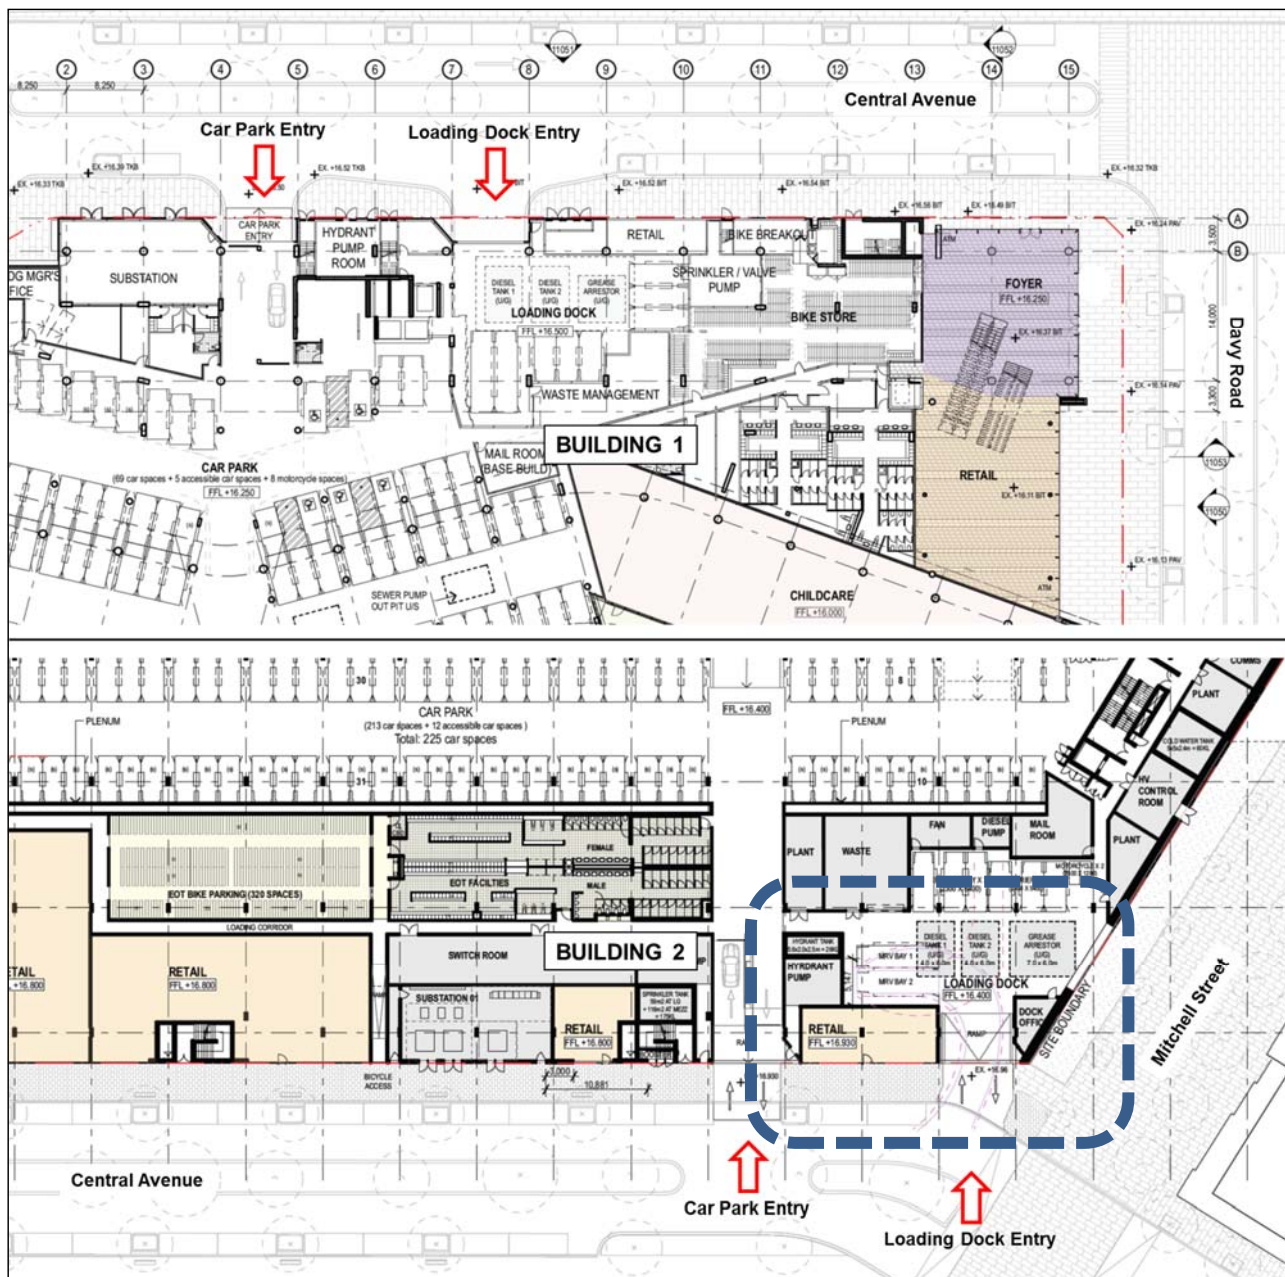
Car park and loading dock entry points for Building 1 (top) and Building 2 (bottom), with the area requiring reconfiguration shown in blue (Base source: Applicant's RtS)
